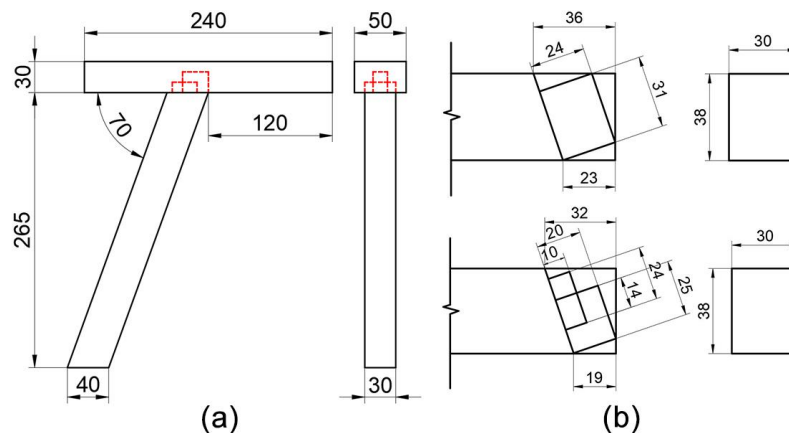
Dimensions of specimen: (a) T-shaped sample; and (b) joints
